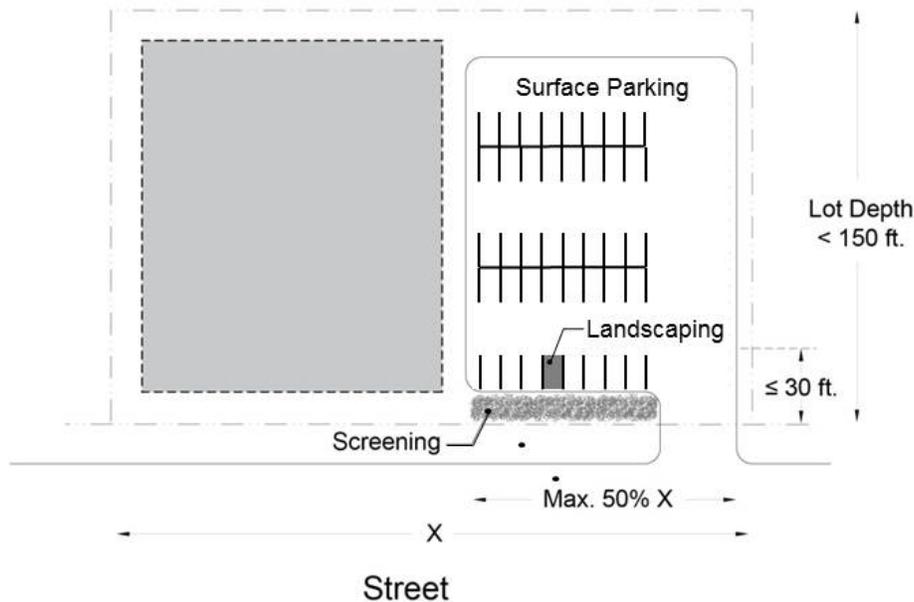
D.1: SURFACE PARKING SETBACK REDUCTION
